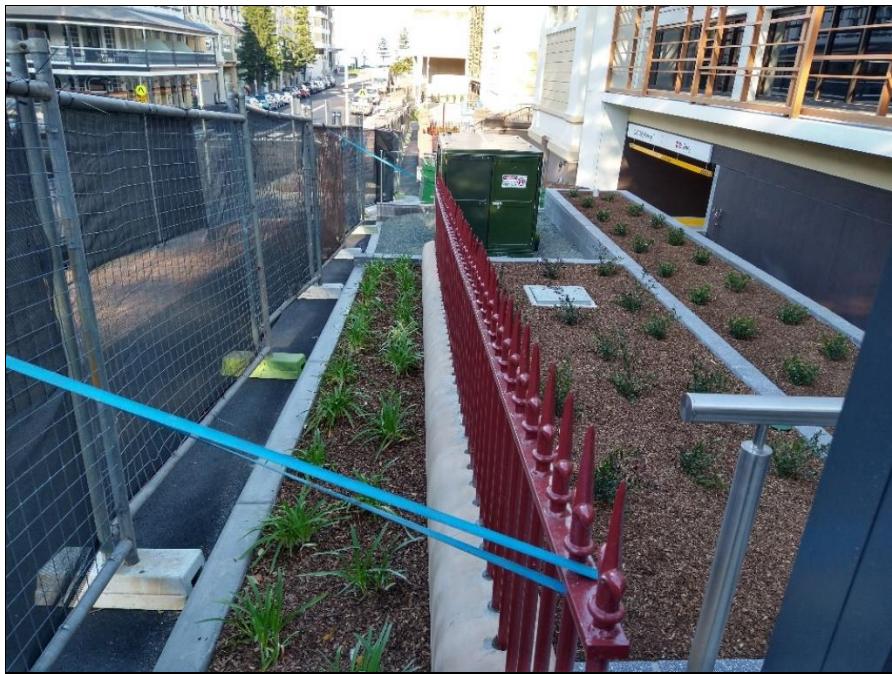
Looking east at asphalt pavement and garden beds along the northern (front) boundary and northern side of the Education Building (20 August 2021)
